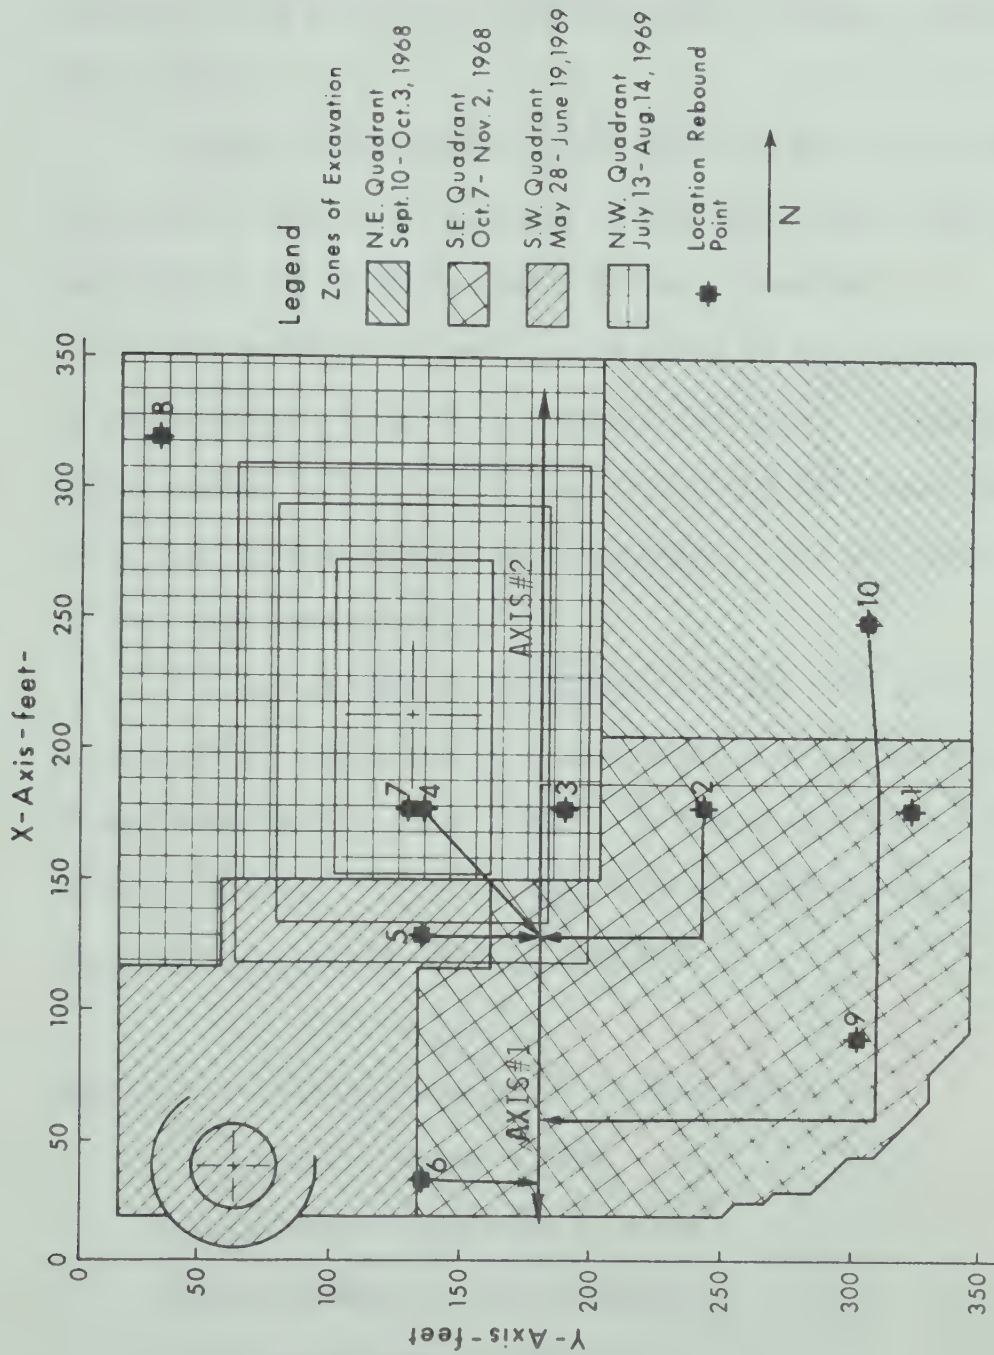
LOCATION OF EXCAVATION ZONES AND REBOUND POINTS - AGT
